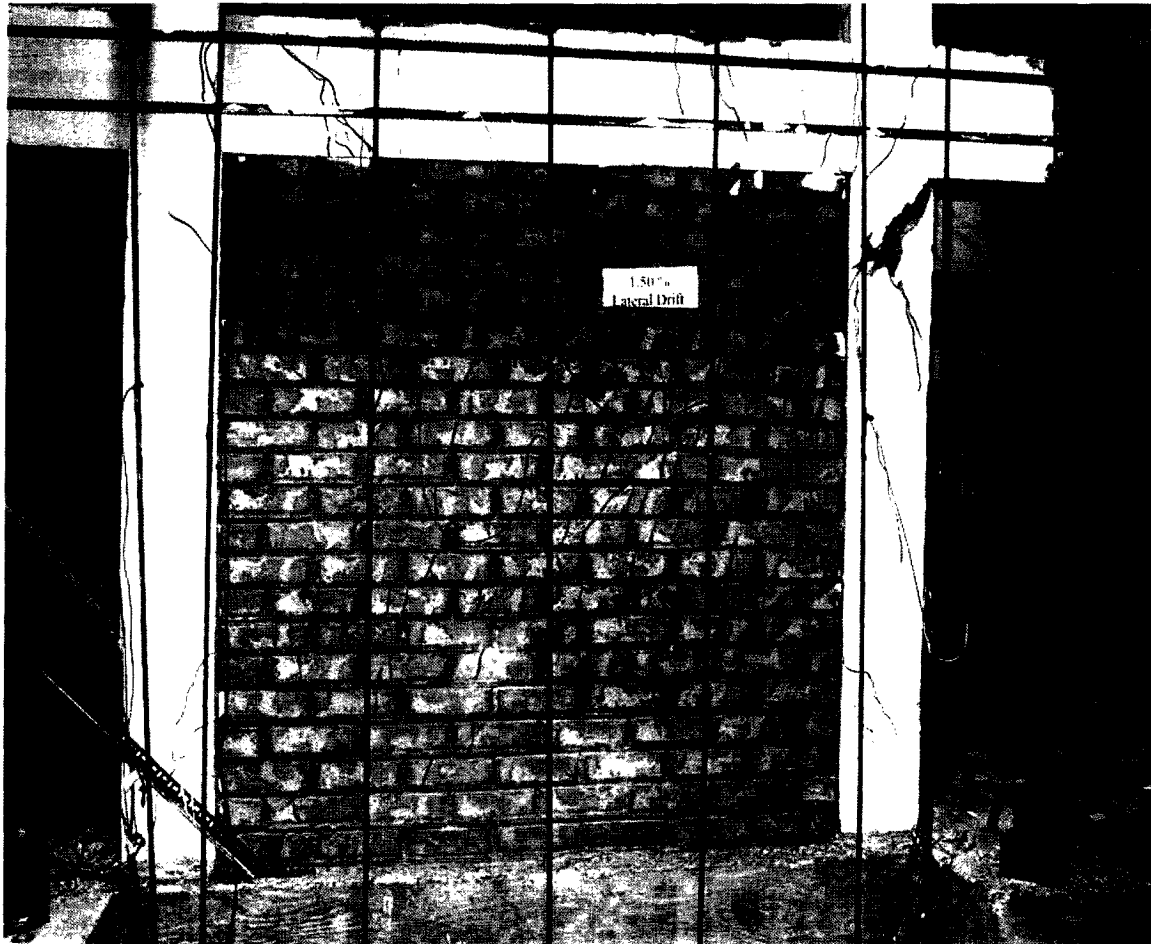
Crack pattern in specimen BR-1 at 1.5 % lateral drift
